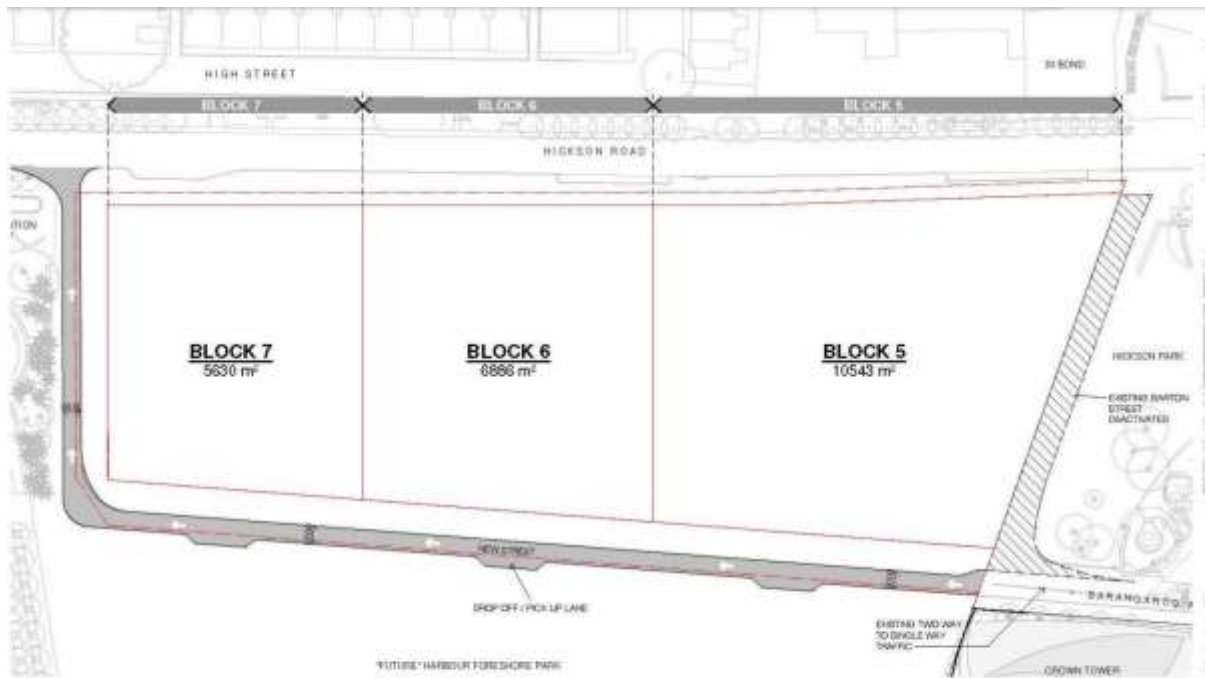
The proposed development blocks for Central Barangaroo under the amended proposal. (Source: SJB 2023)
